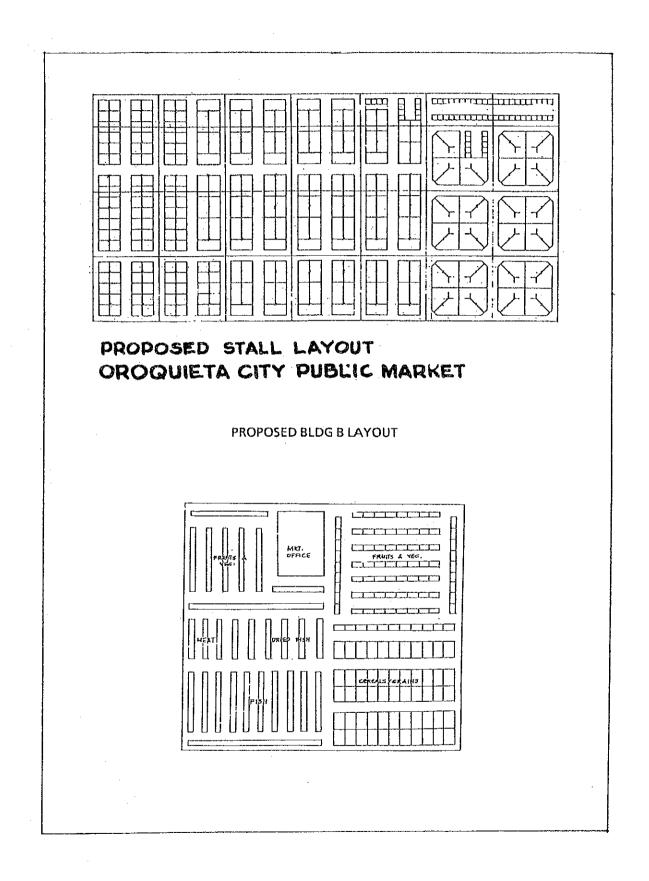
1 - 18: Oroquieta City, Floor plan of the existing B block.
